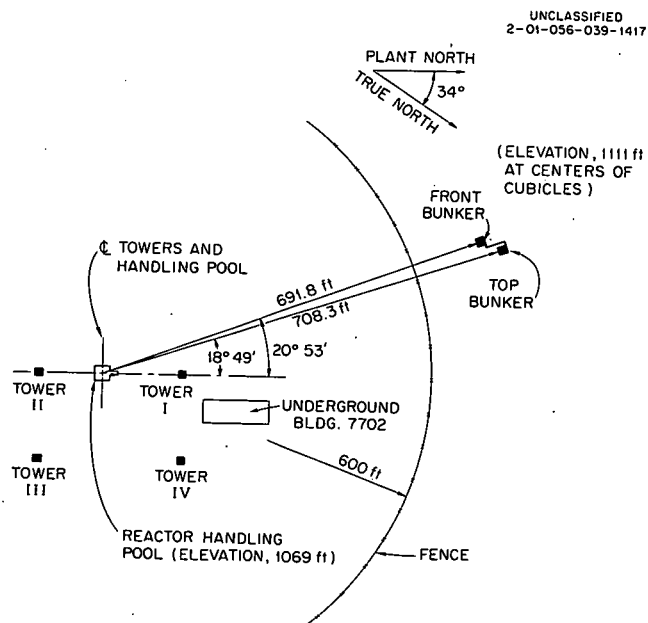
Site Plan of the Tower Shielding Facility Showing Location of Bunkers.
